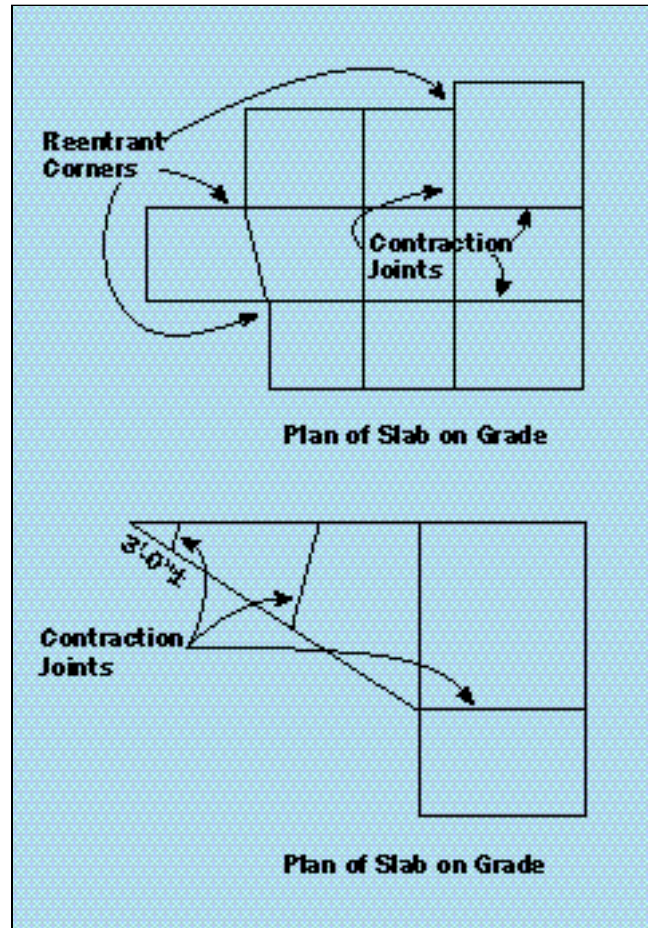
Sawcut joints in the same locations that hand-tooled joints require. Be sure to locate a contraction joint at all reentrant corners to prevent radial cracking of the slab.
